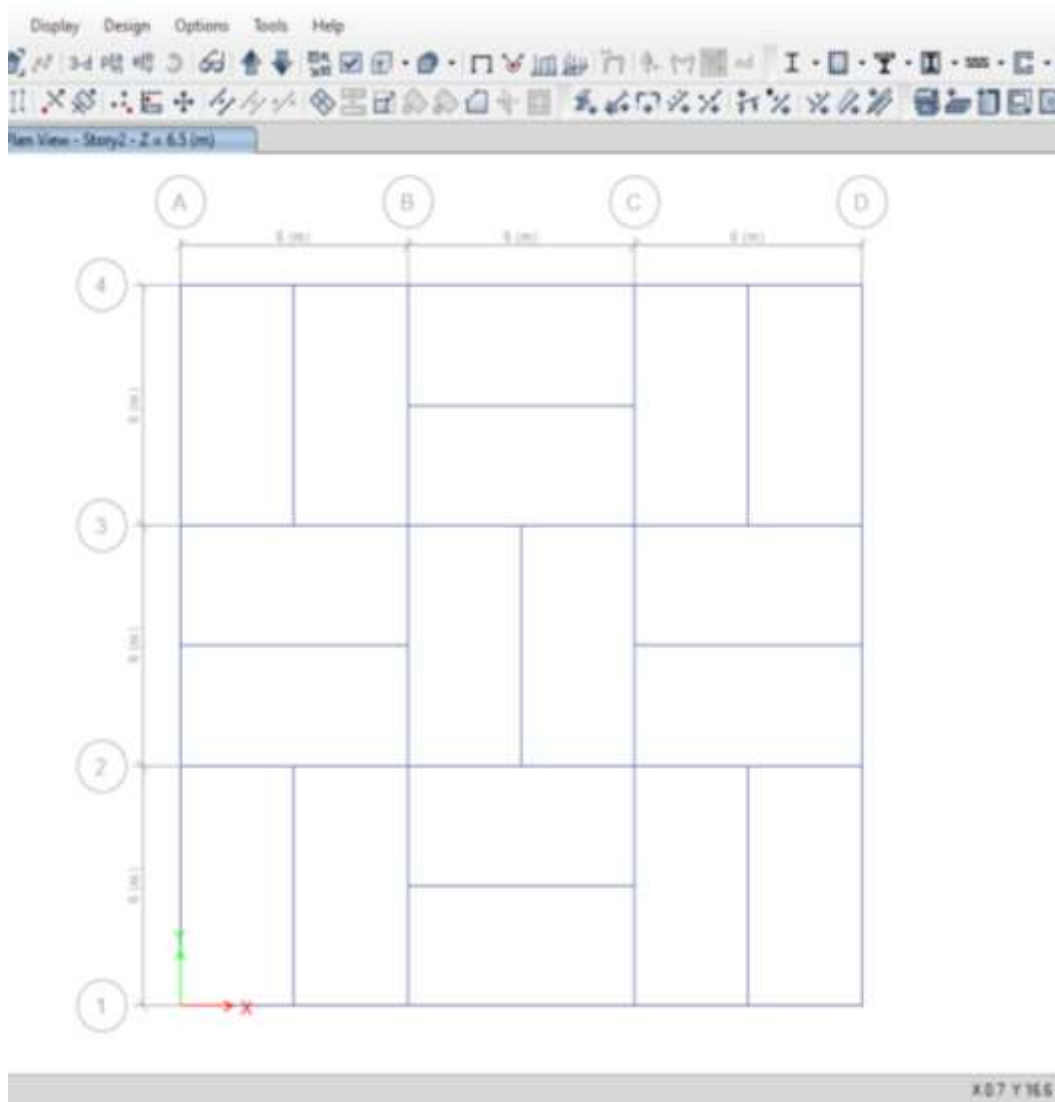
(a) Main beam and secondary beam assigned as per plan.
